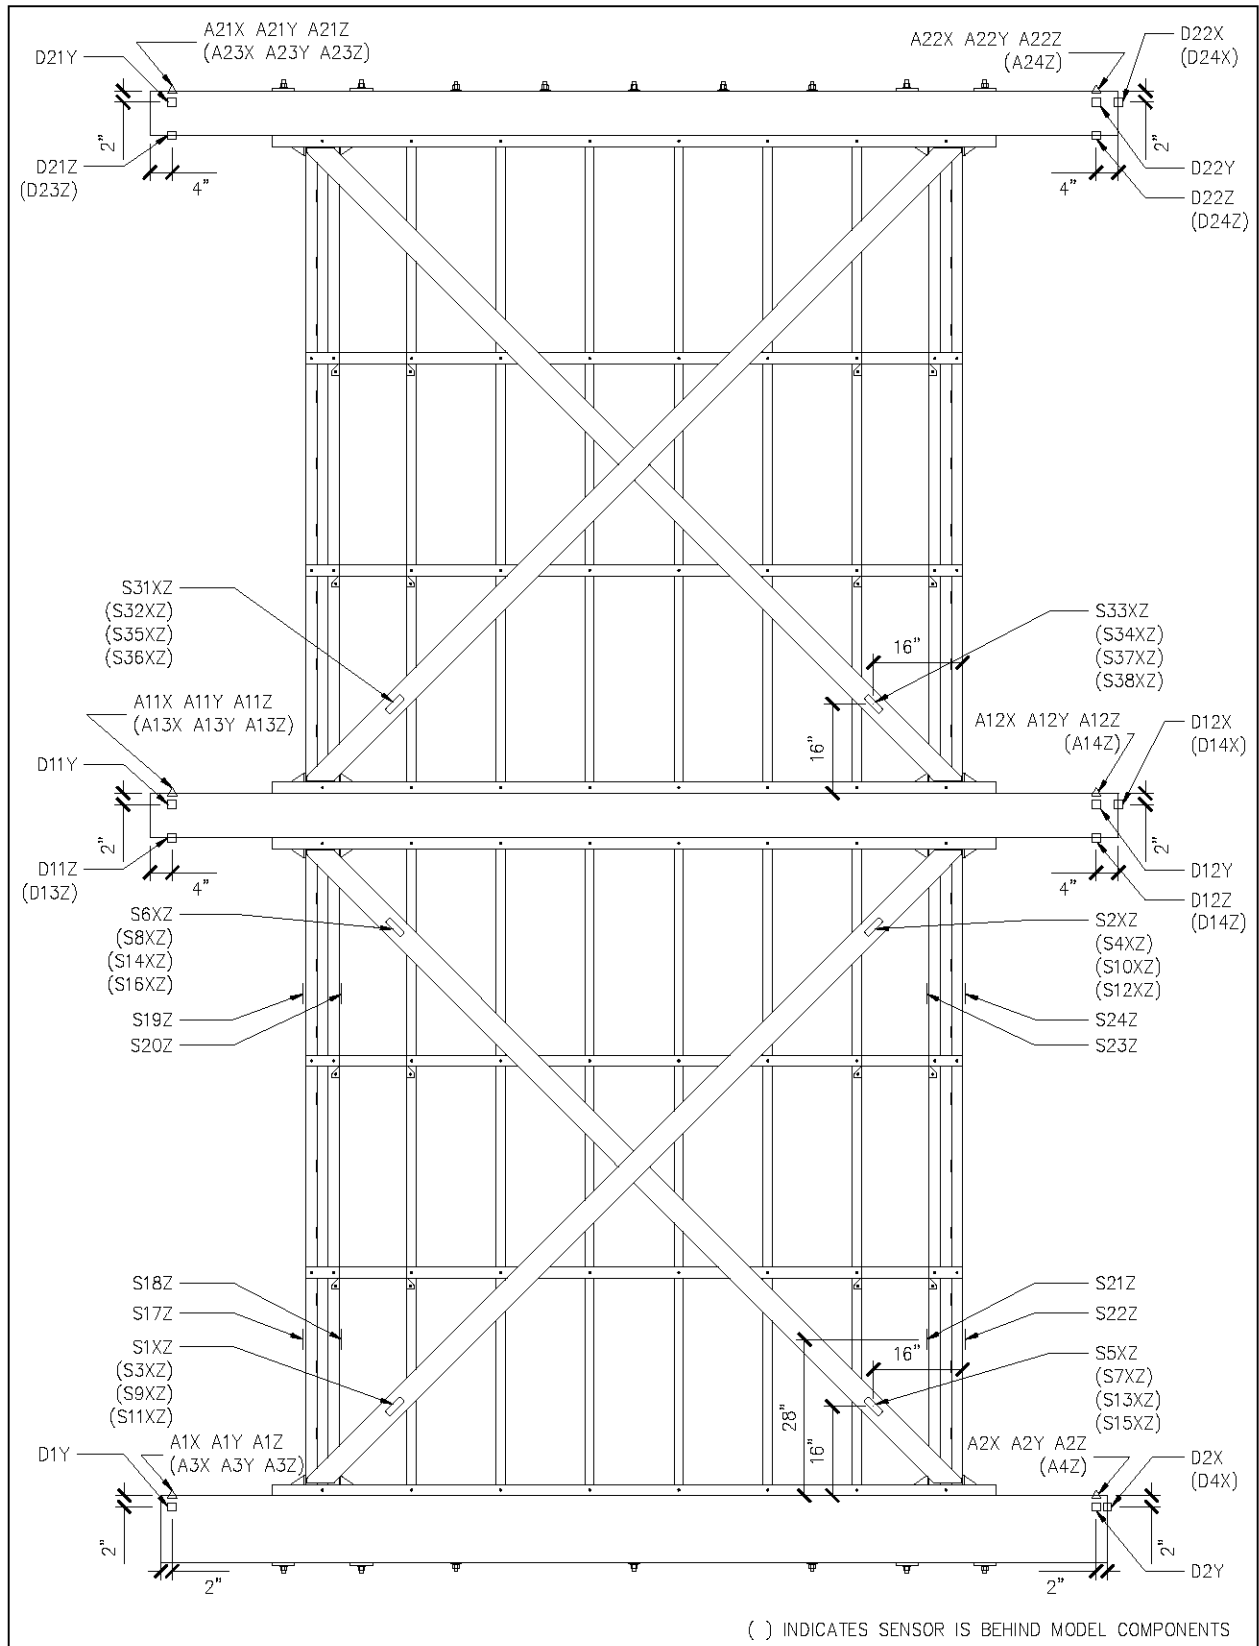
Out-of-plane elevation drawing showing instrumentation.
